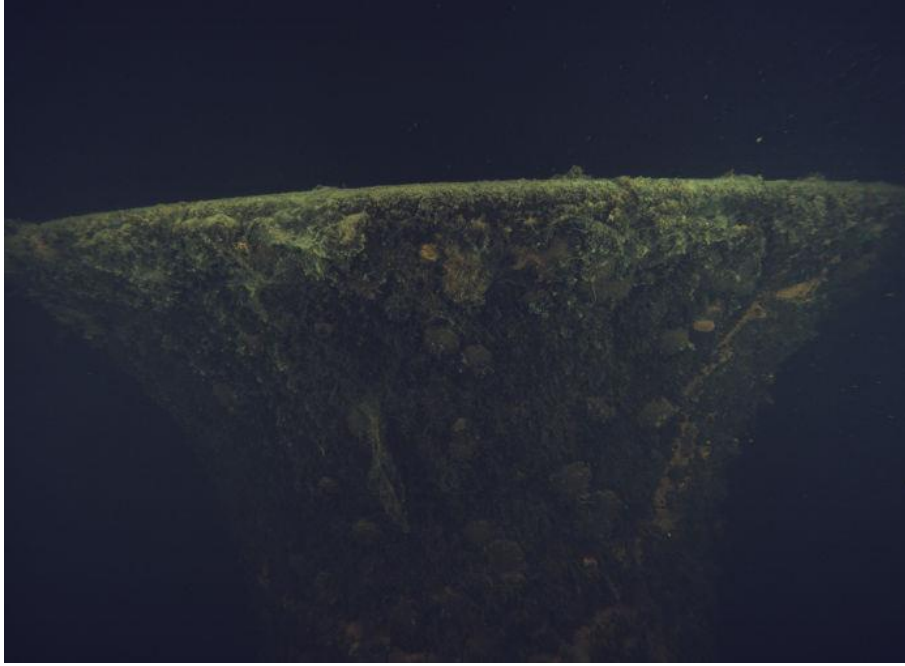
Inspection video of outlet tower earthing and lightning cables ([click here](#) or on the image above to launch).
